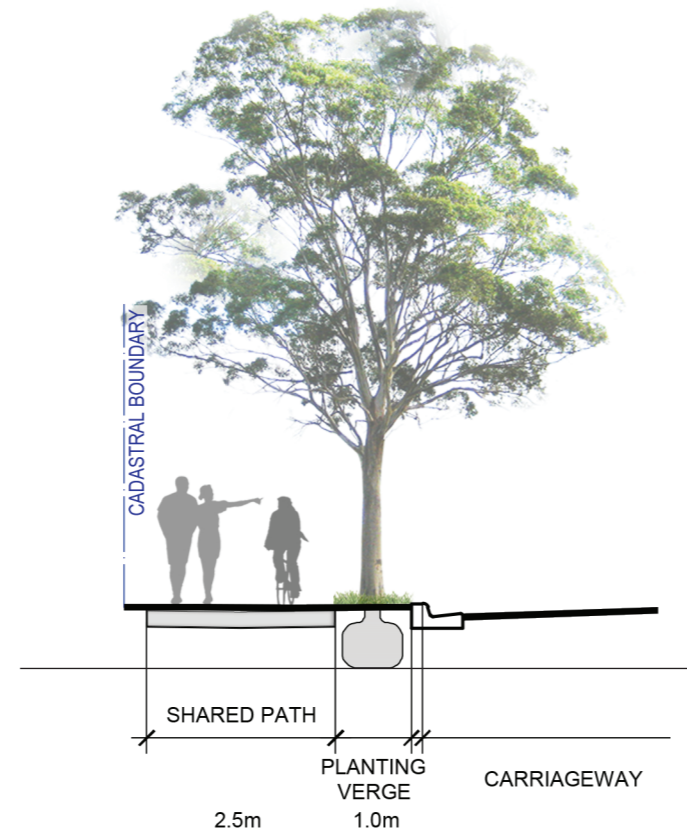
TYPICAL STREET TREE PLANTING - GENERAL APPROACH
